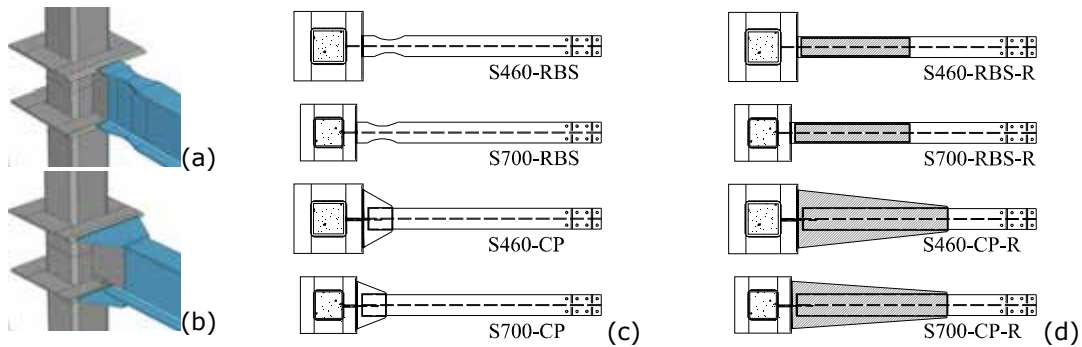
Welded external diaphragm beam-to-column joints with reduced beam section (a), cover plates (b), designed joint specimens (c), and corresponding joint specimens with reinforced beam (d)
